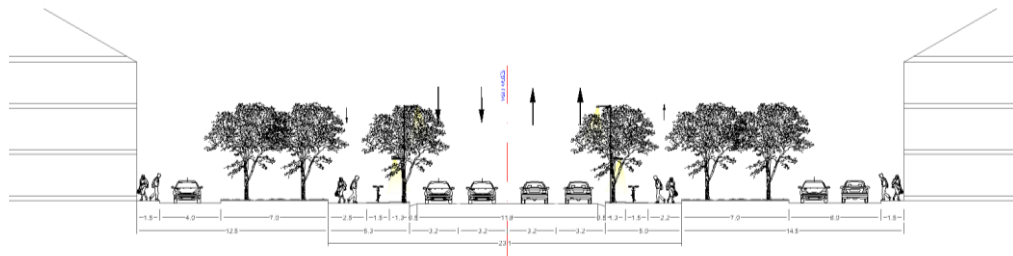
Main Road "Llazi Miho" section (drafted by the author)
